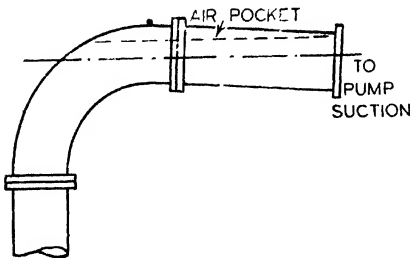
INCORRECT PIPE ARRANGEMENT—PIPE SLOPING DOWN TO PUMP
